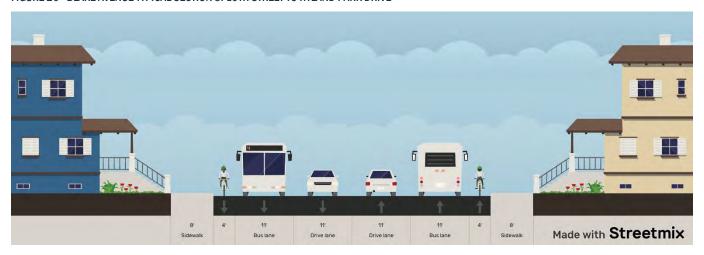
BLAKE AVENUE TYPICAL SECTION 4: HYLAND PARK DRIVE TO 8TH STREET
